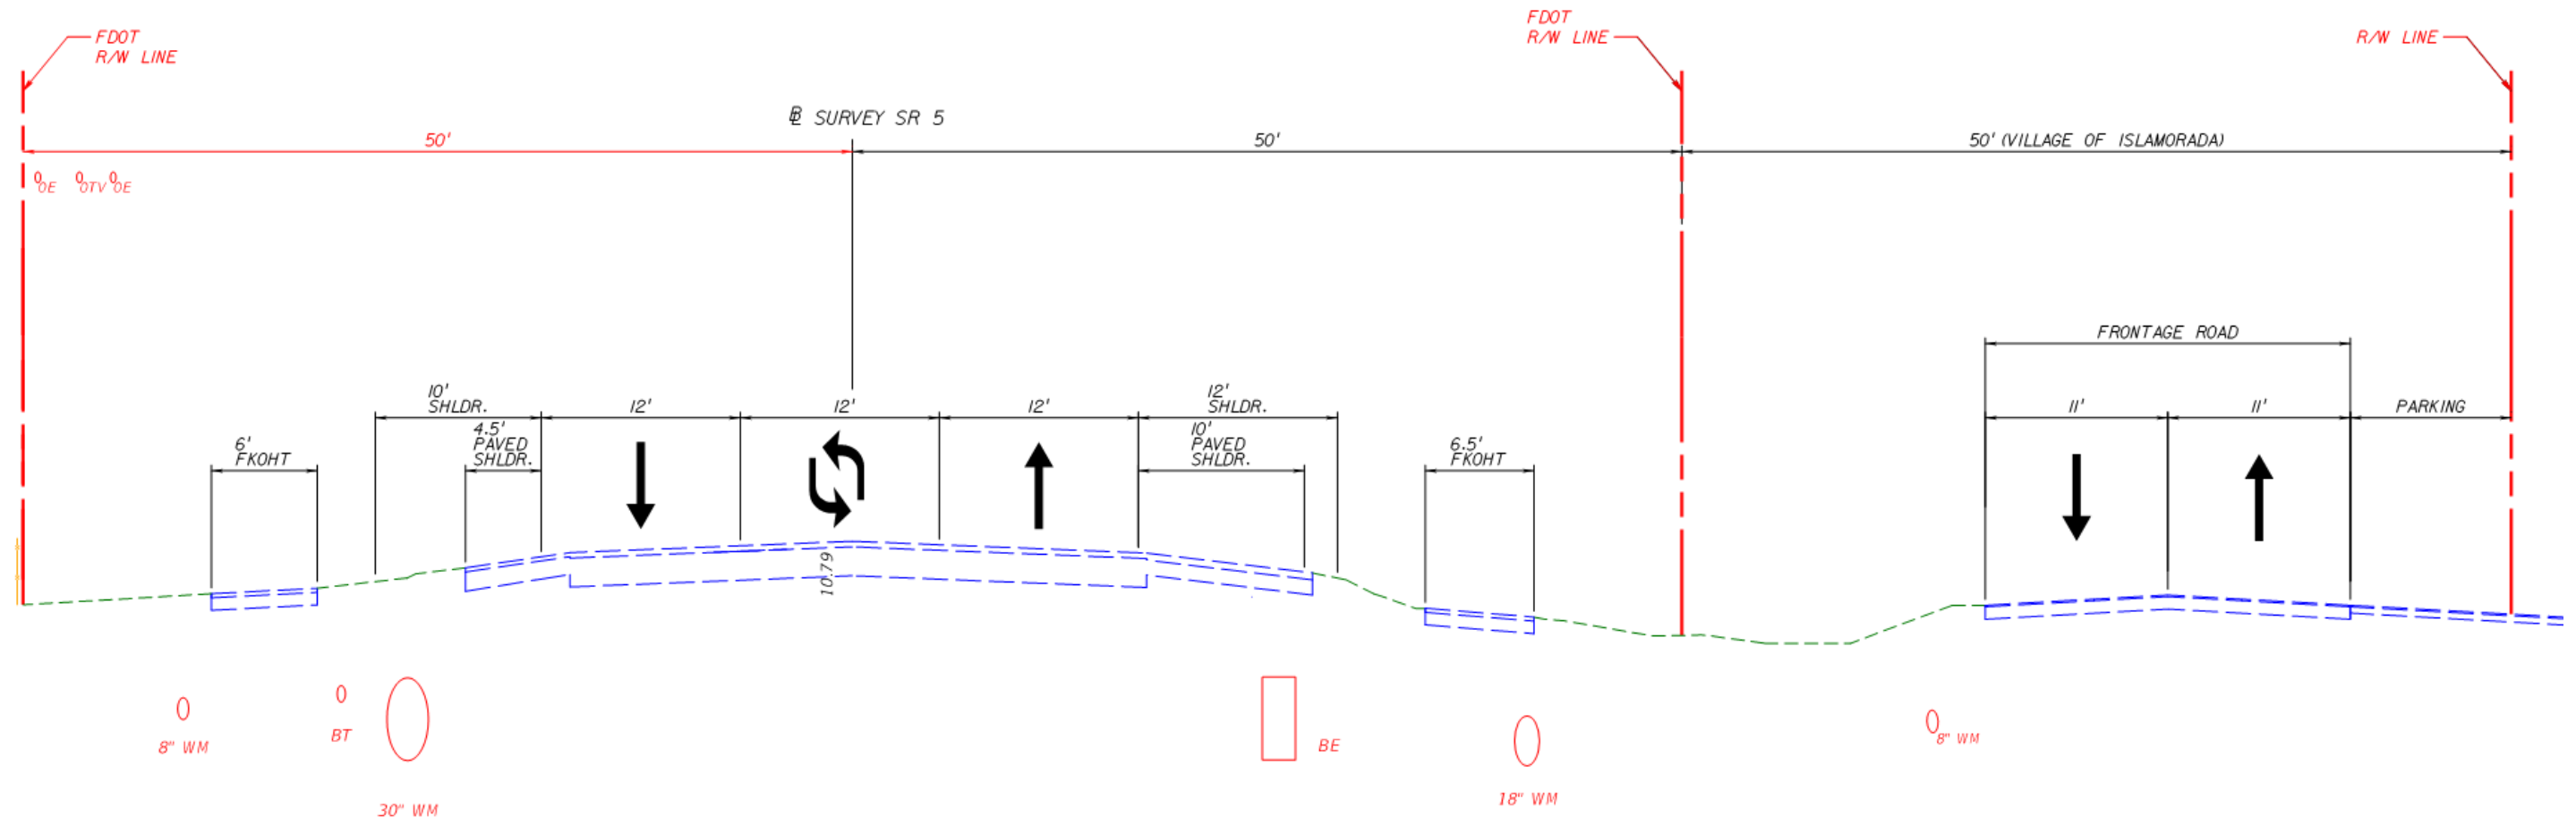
Location 4 (MM ±81.6) Existing Typical Section
